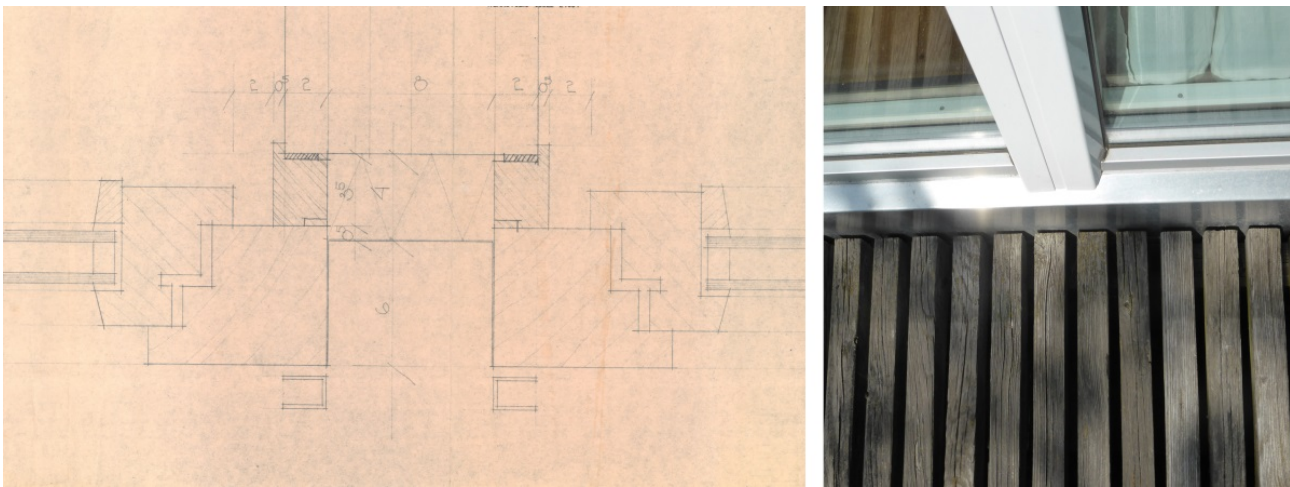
left: original detail of window connection to glulam column, with exterior profiles for electric driven wooden shutters right: a new passive house window in wood with aluminum to the outside. The outside floor in larch exists since the house was built. (picture taken 2015)
